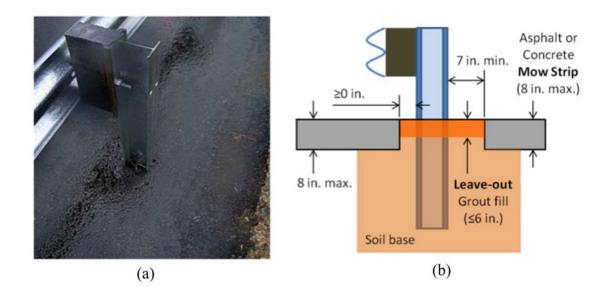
Guardrail Installations: (a) Typical Installation in Georgia; (b) Installation Incorporating Grout Leave-outs as Recommended in the *Roadside Design Guide* [3]
